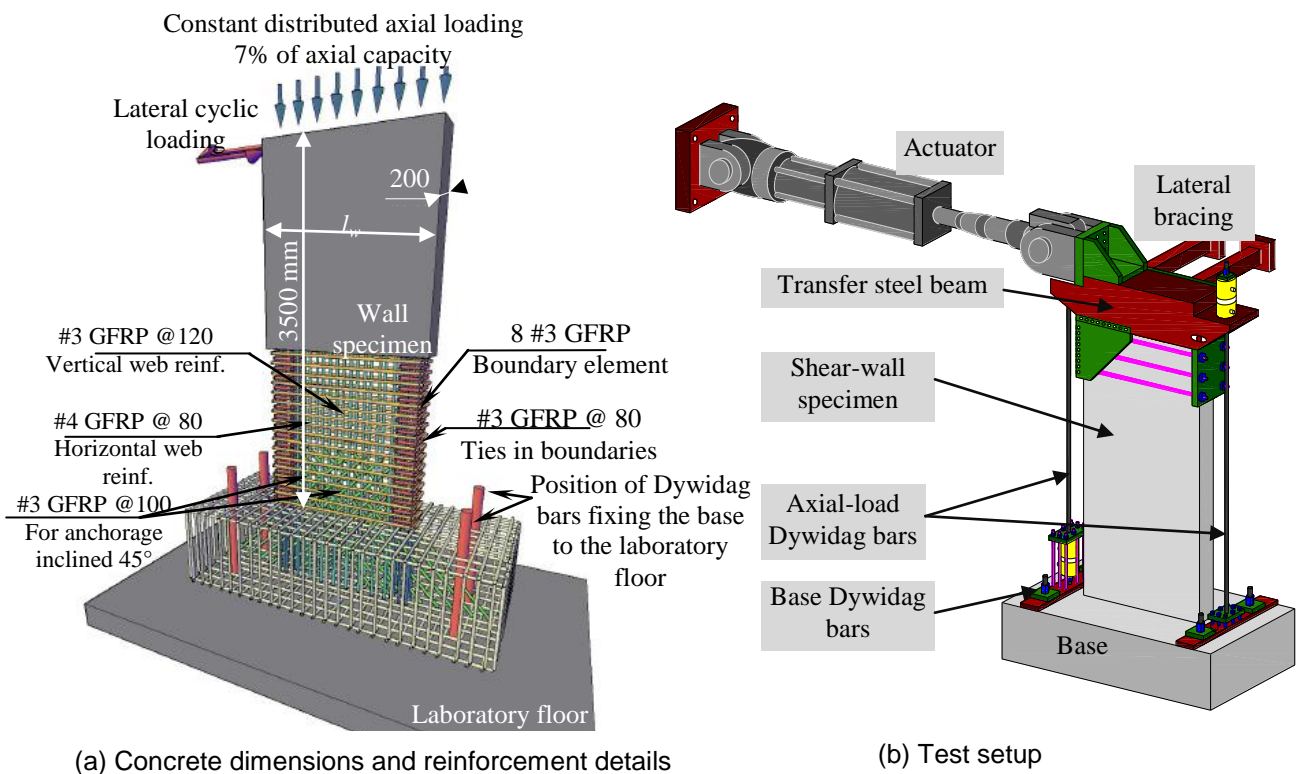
Concrete Dimension, Reinforcement Details, and Test Setup
